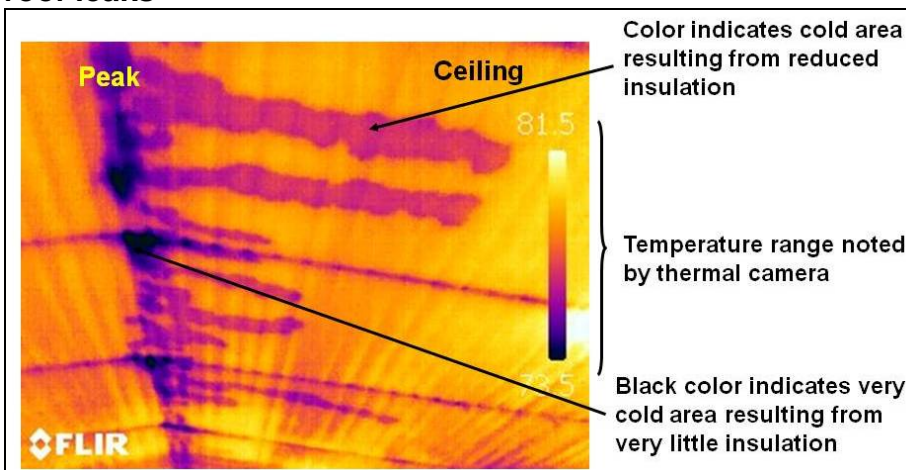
Thermal image showing damaged ceiling insulation caused by roof leaks
